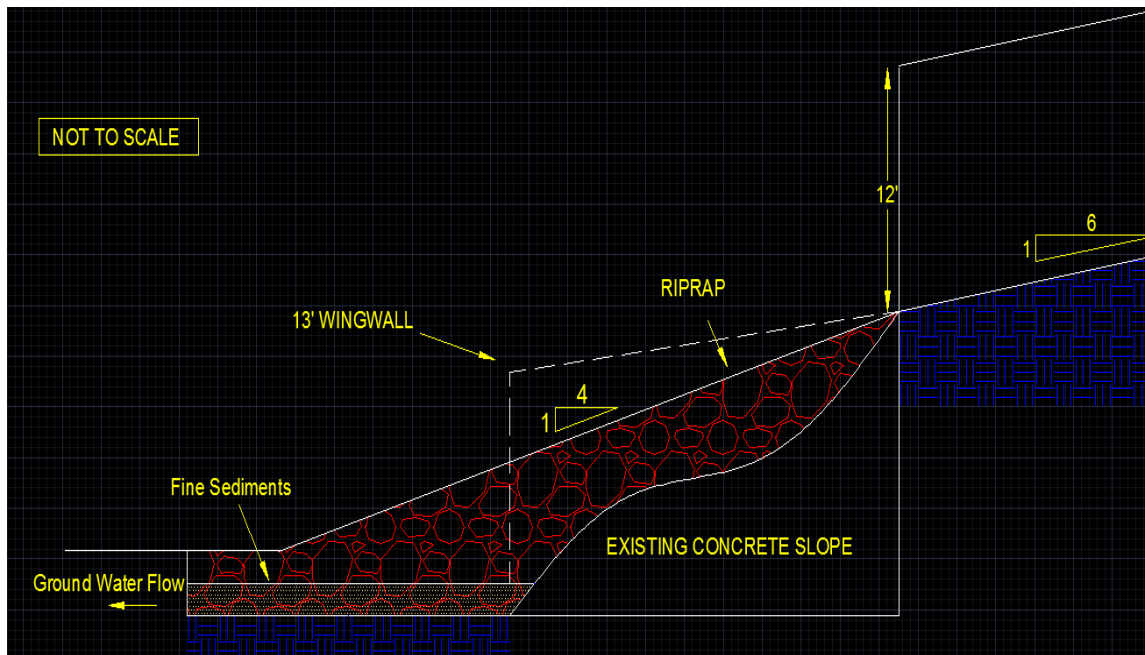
CAD drawing of proposed riprap, cross sectional view.
